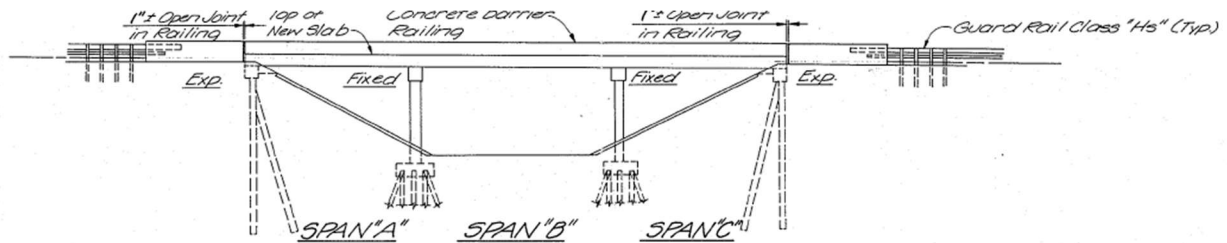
Elevation View of Bridge (NBI 14650) (1991)
